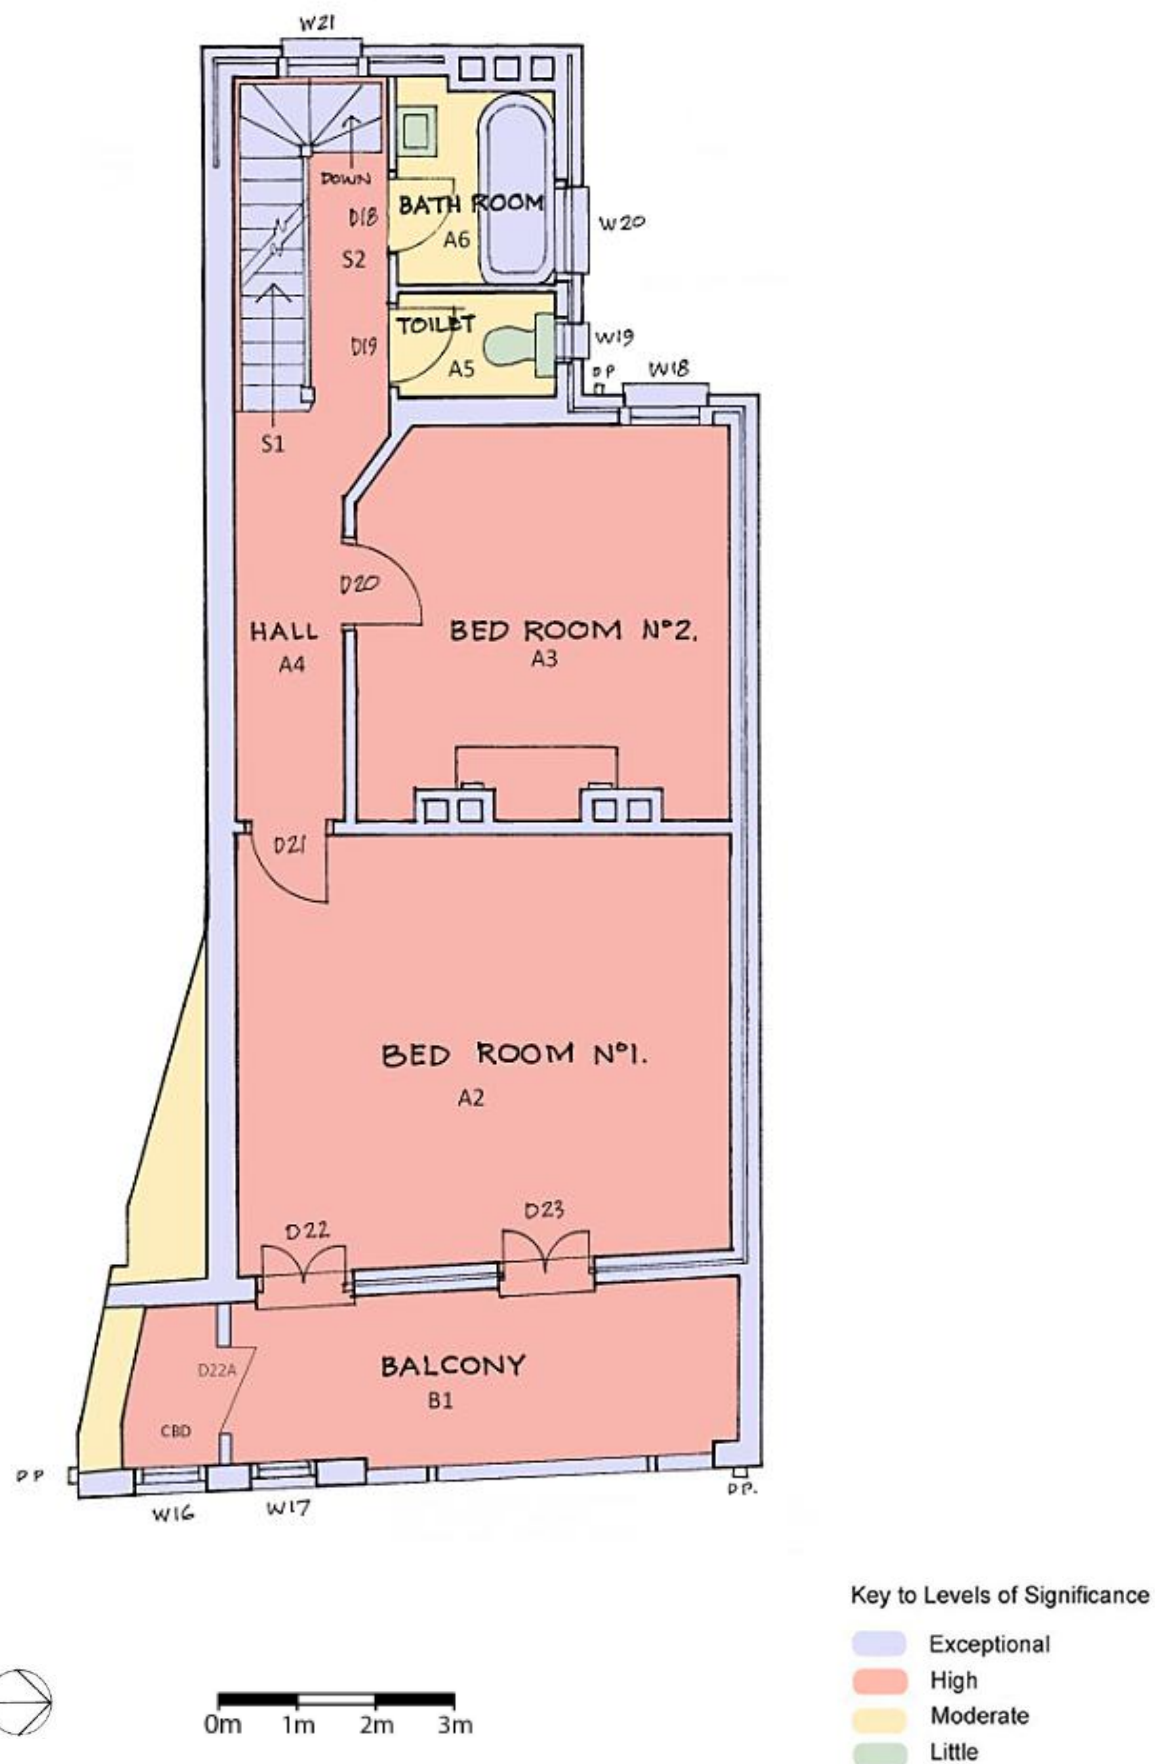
117-117A Gloucester Street – Second floor grading of significance.
